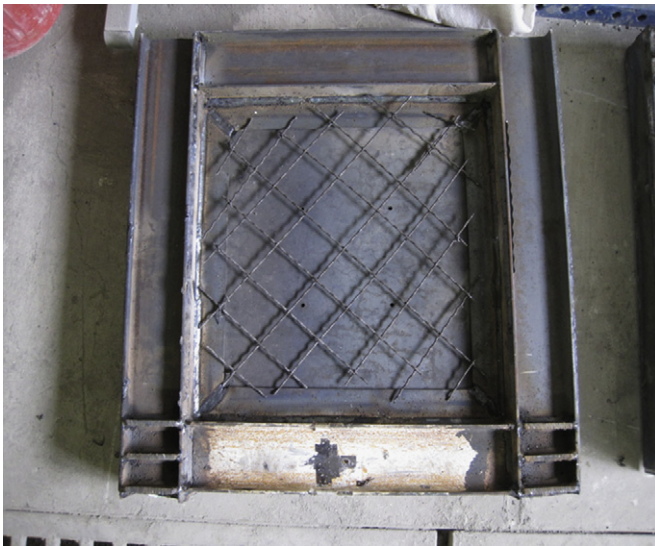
Arranging of reinforced bars in the SC1-3 specimen.
